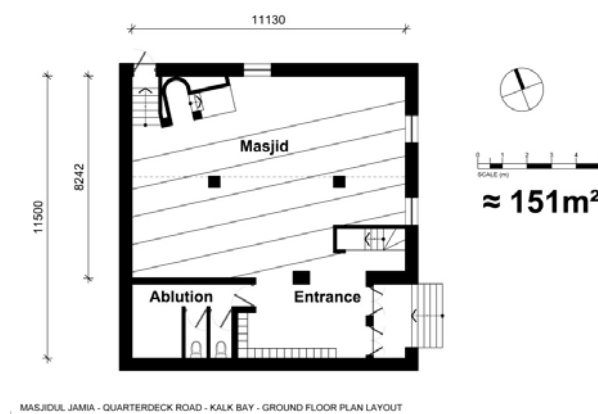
Plan showing proposed new alterations Source Amien Paleker - architect
